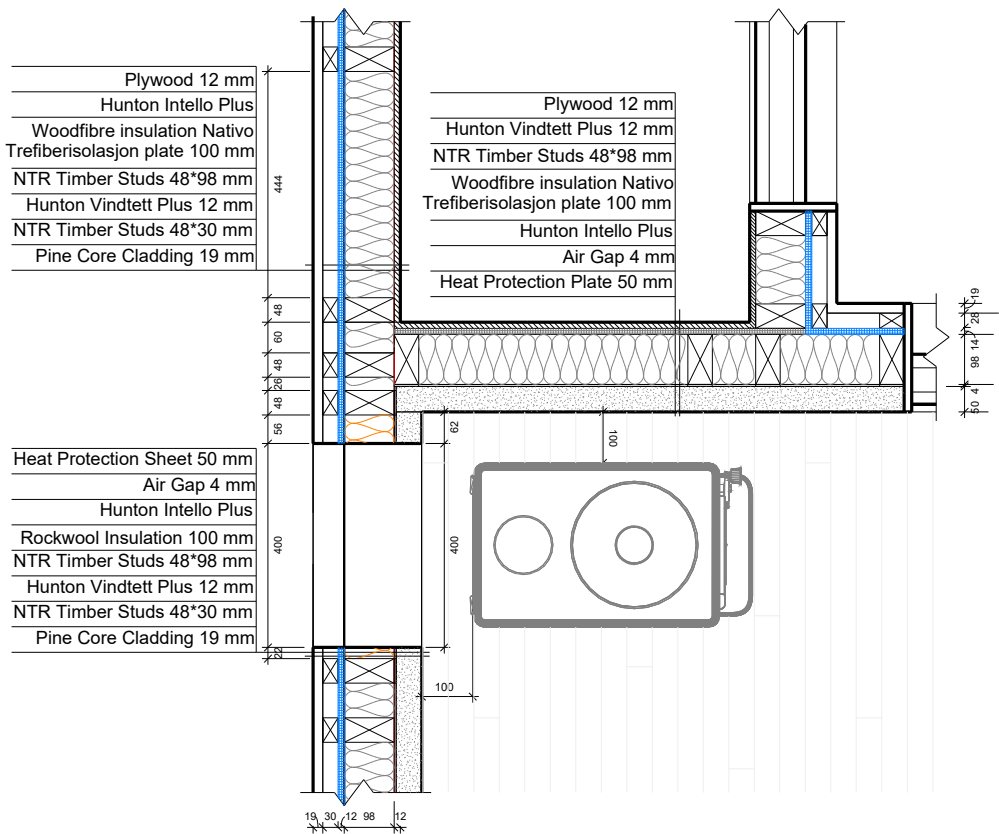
DETAIL OF PLAN. SCALE 1:10
